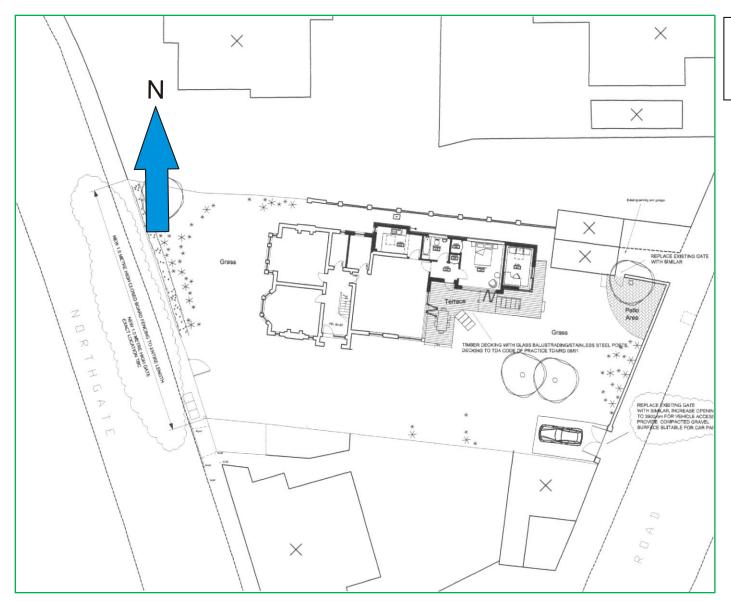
Site Proposal Plan at a scale of 1:400 at A4 (extract from Architects plan)
